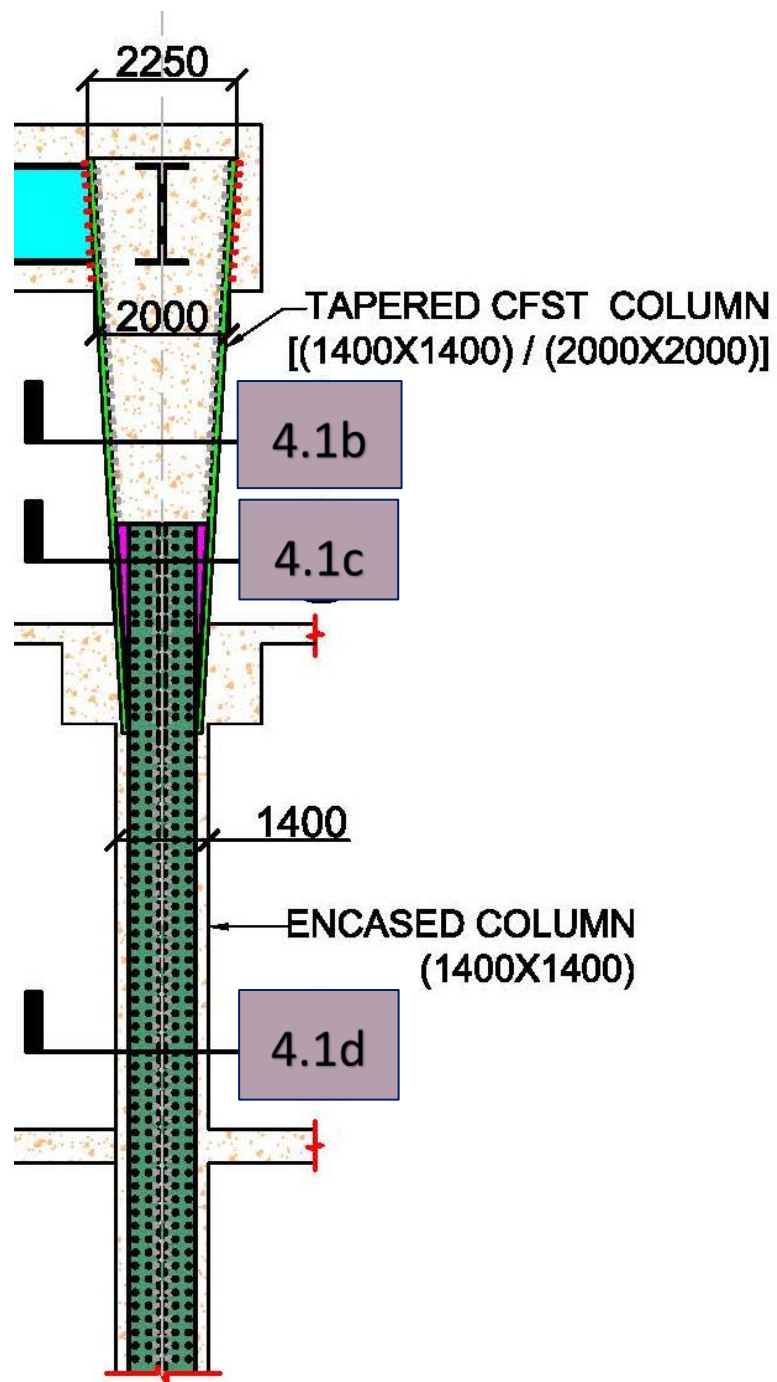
Detail-A Case Study, Enlarged Column Elevation
